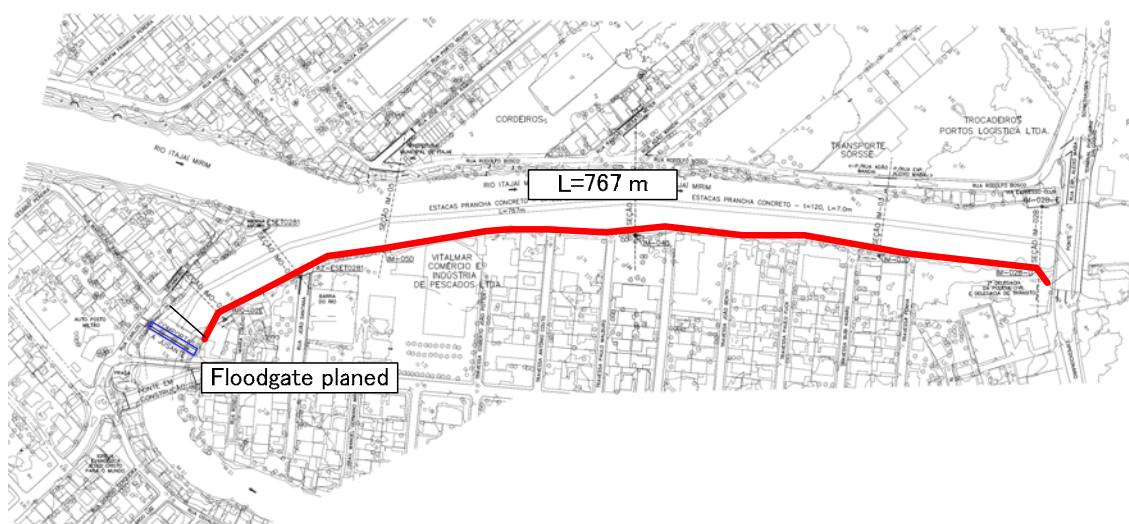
General Layout Plan of Upstream Floodgate (3/3)
